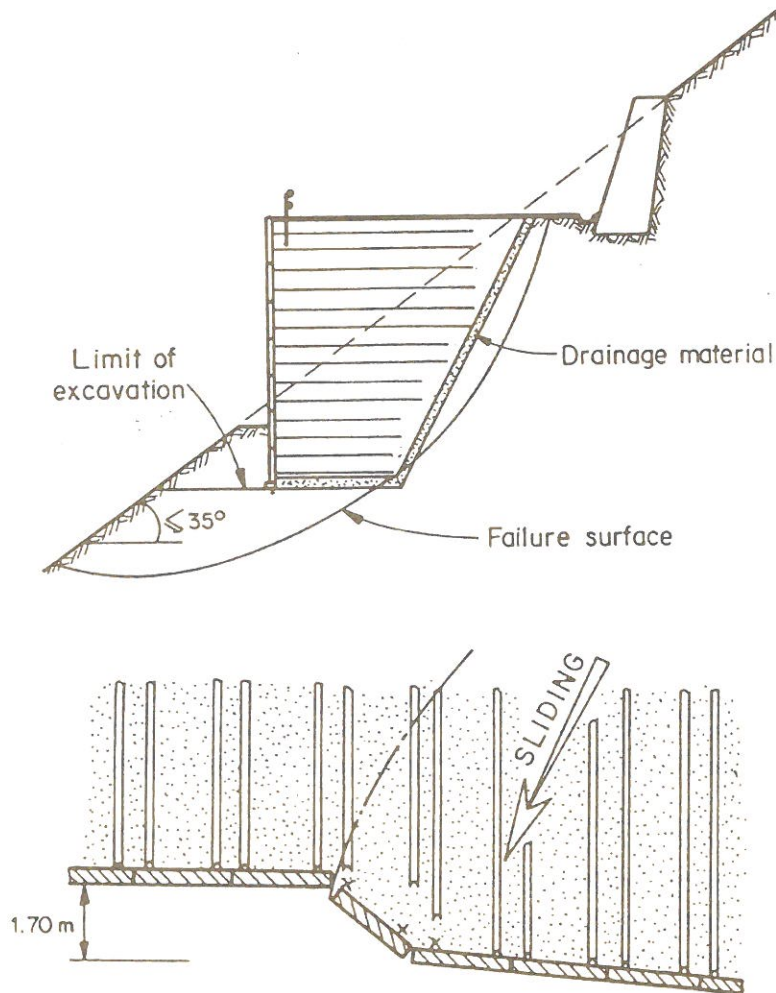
Reinforced Earth wall constructed for the highway access to the Frejus tunnel
